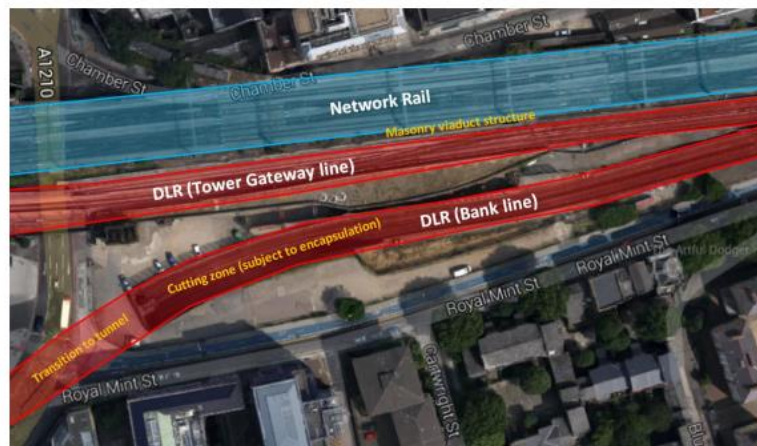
Site footprint and arrangement of existing infrastructure assets
